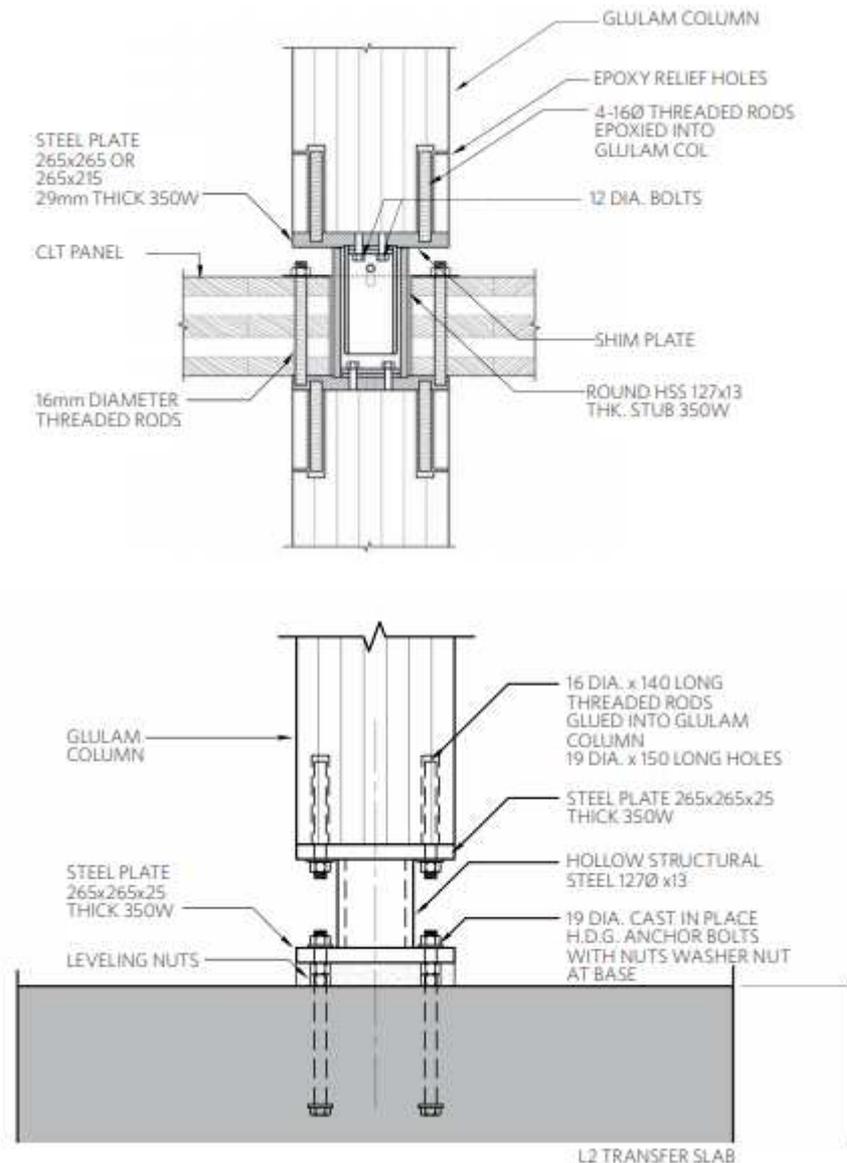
Structural connections for Brock Commons (Pilon et al., 2016b)
